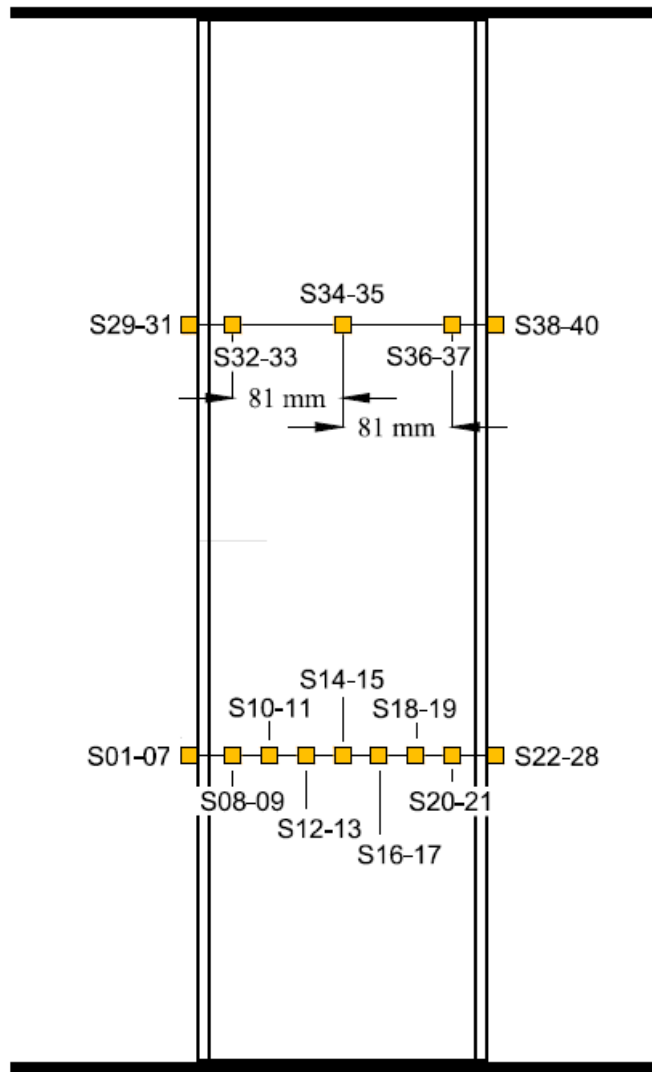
Numbering and layout of tunnel strain gauges (SGs) in plan view.
